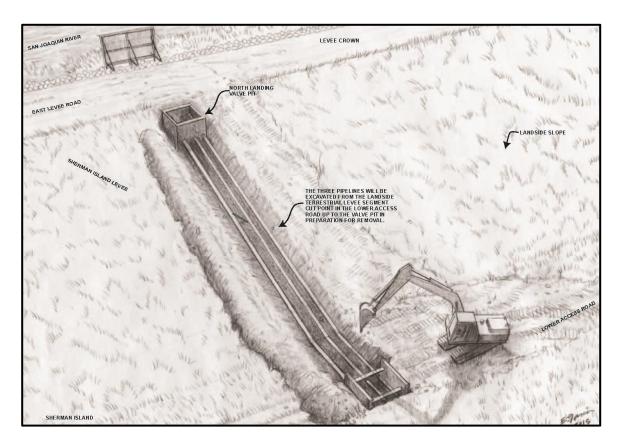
Landside Terrestrial Levee Segment Excavation and Removal
